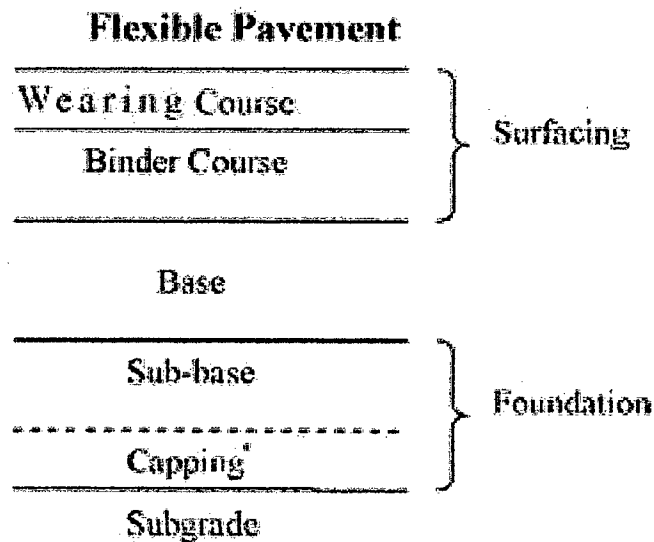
Typical structural layers of flexible pavements (Huang, 2007).
